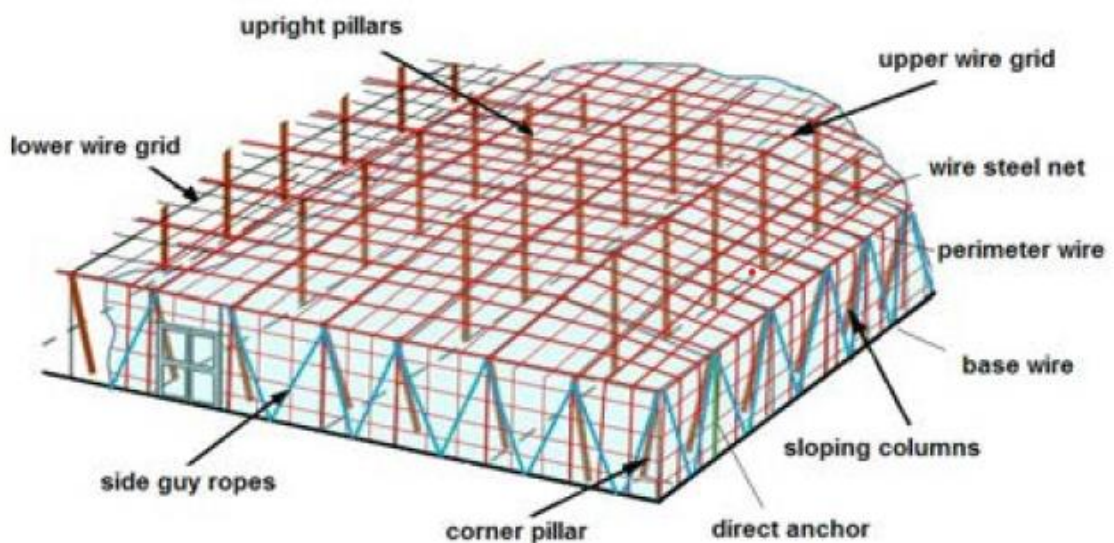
Almería type greenhouse (flat top). Source: Valera et al. (2017), p.57
